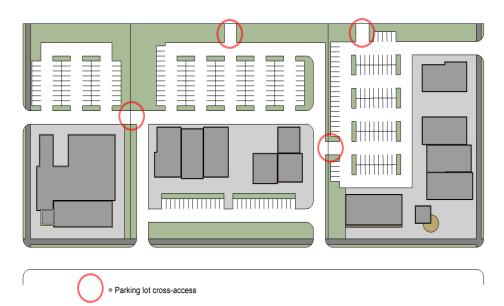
C.2.c.2(a) : Example of Vehicular Parking Area Cross Access
